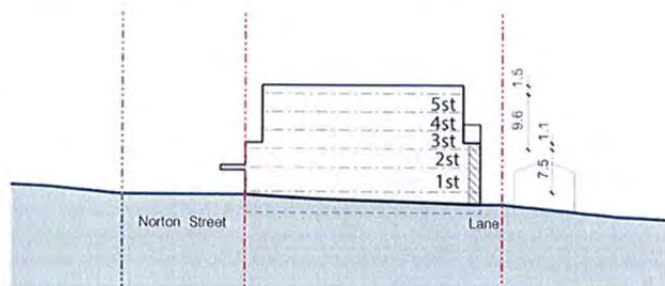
Carlisle Street - Building envelope - Section D-D
